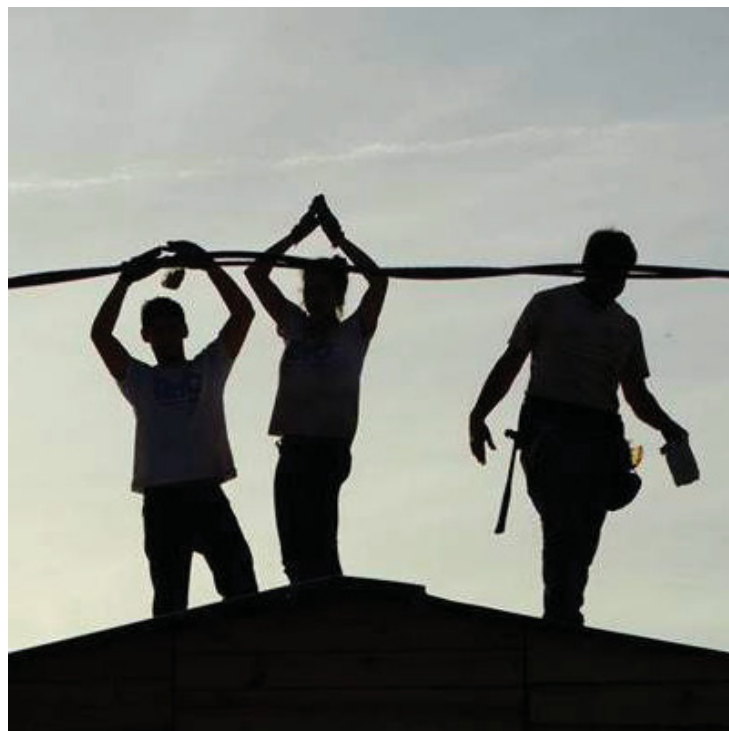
TETO HANDSIGN ON NEW ROOF BUILD
